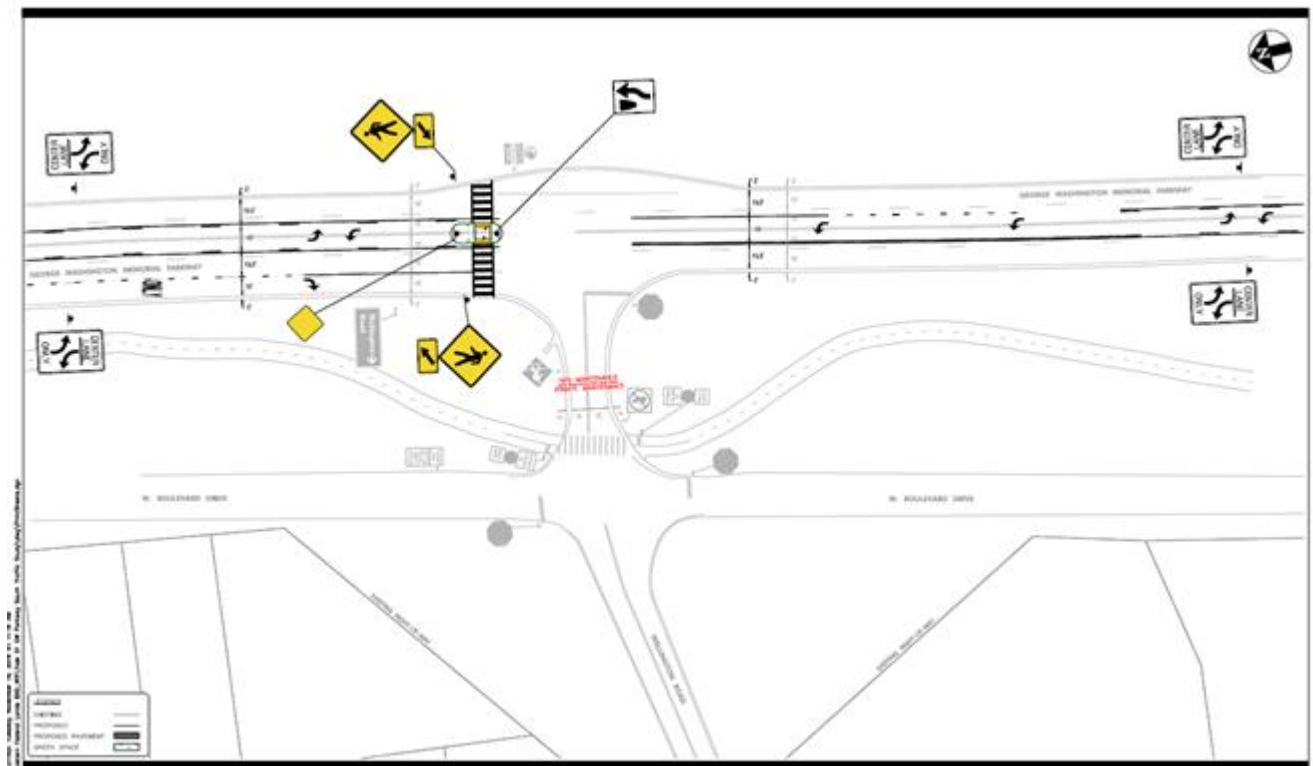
Example Pedestrian Refuge Island and Road Diet Concept Design at Wellington Road
